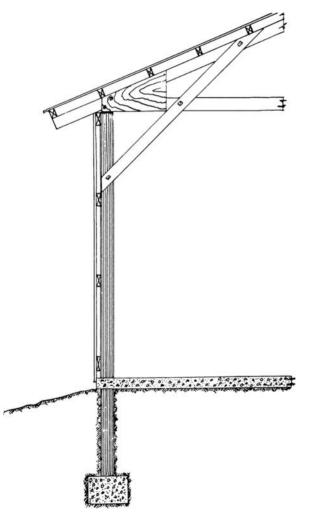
Enlarged detail of a pole-and-truss connection.
